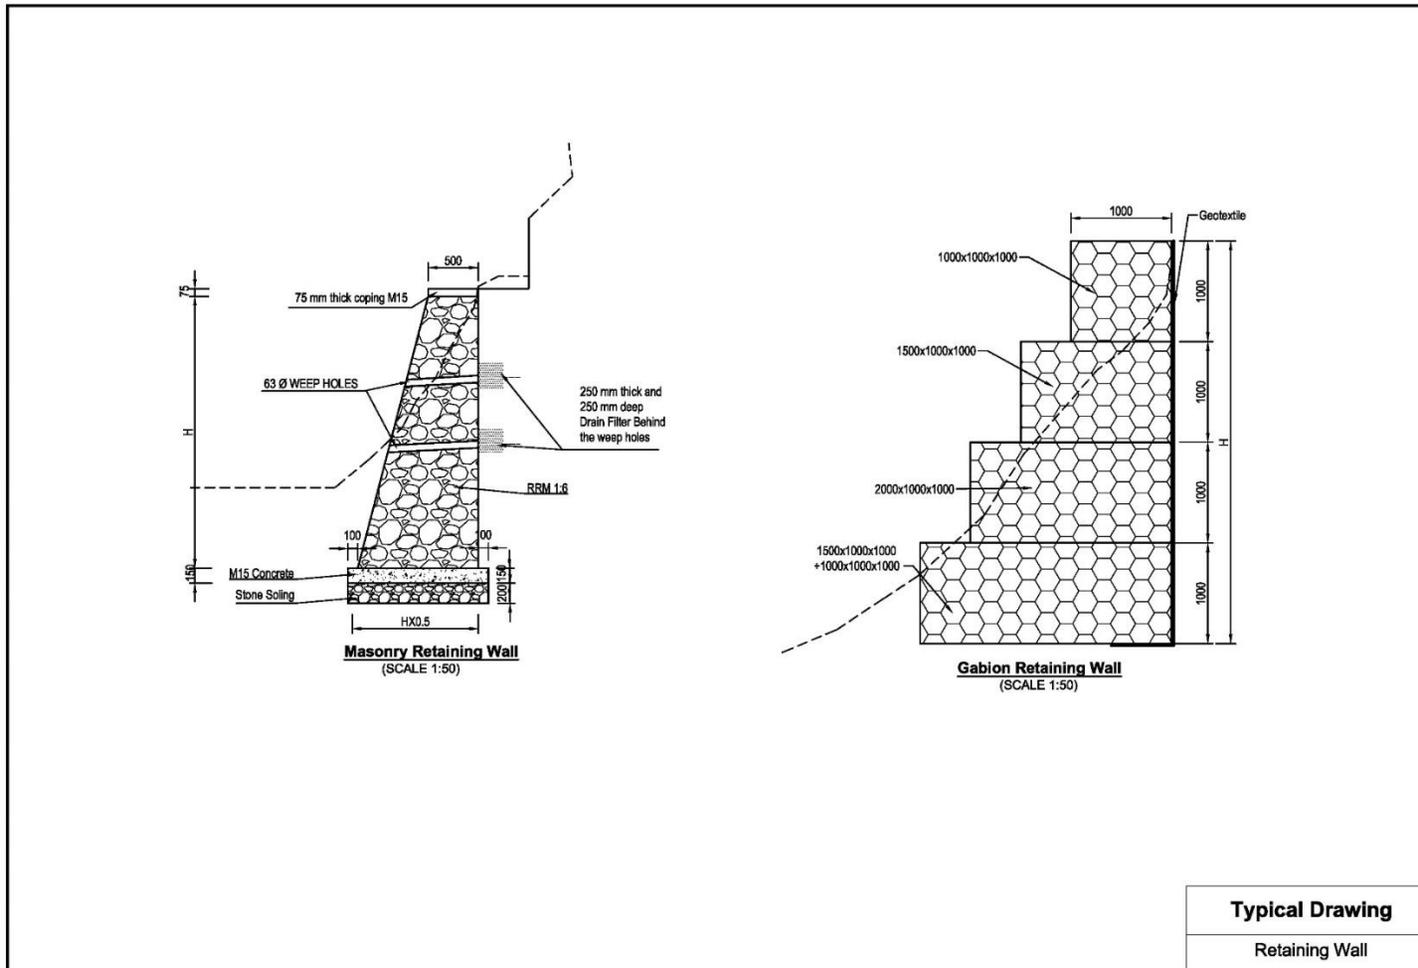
Typical drawing of Retaining Wall proposed for the Irrigation Subprojects
